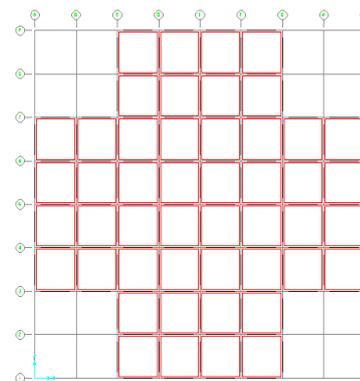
Building plan dimension (Common to all floors, all models; units 'm').
